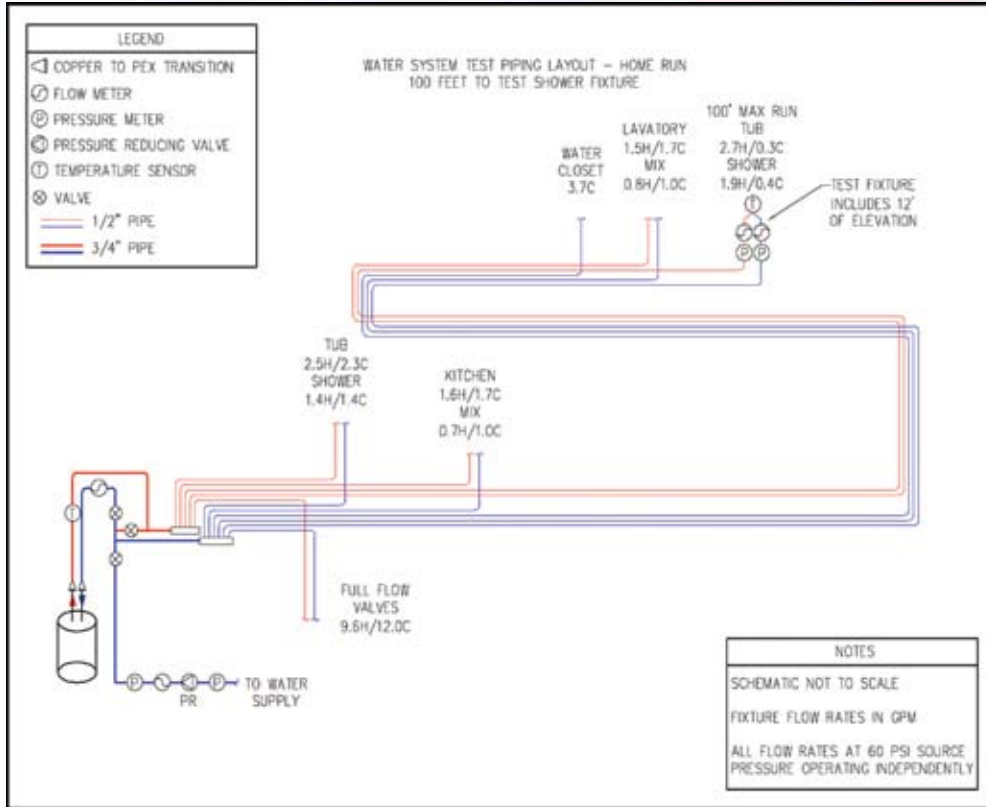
Water System Test Piping Layout – Home-Run, 100' to TF
